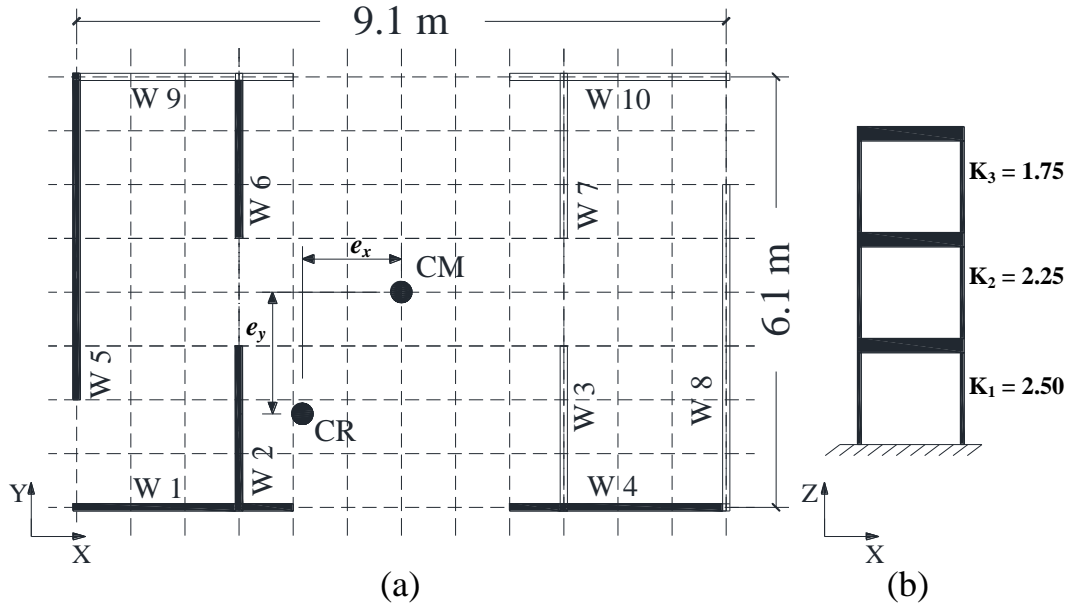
A 3-story building with excessive torsion: (a) plan view; (b) elevation view.
